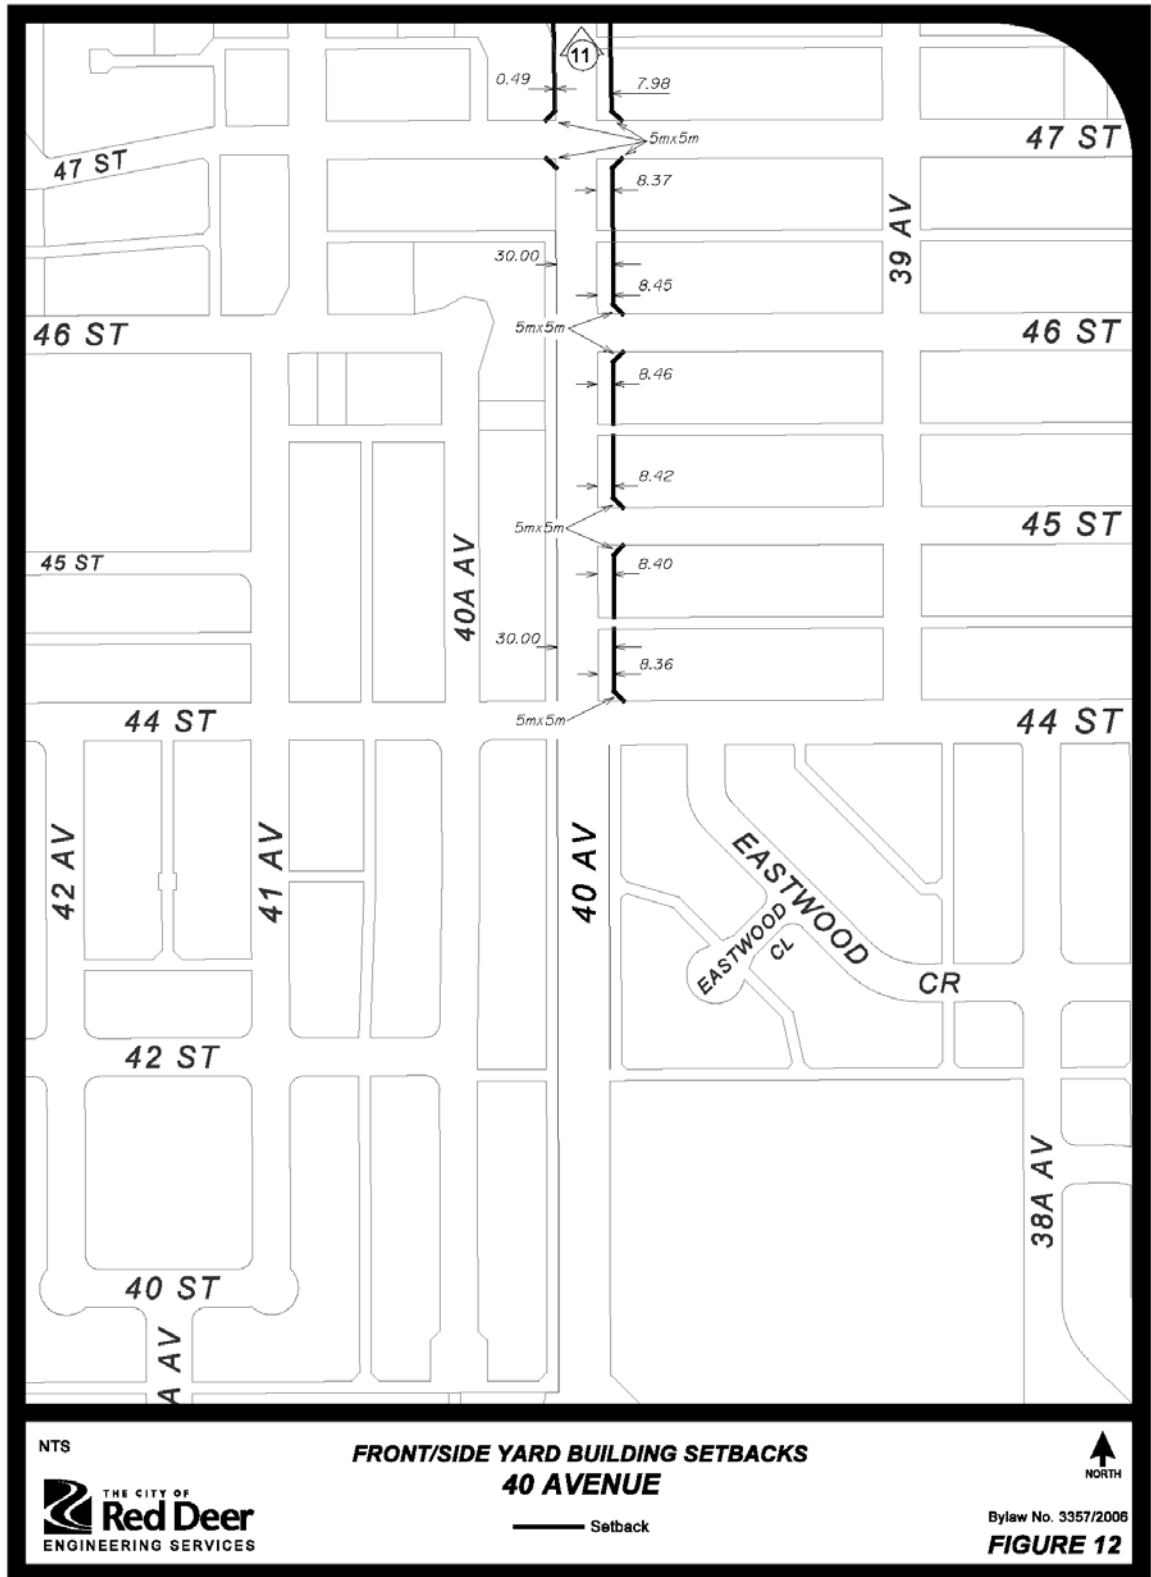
Front/Side Yard Building Setbacks 40 Avenue
